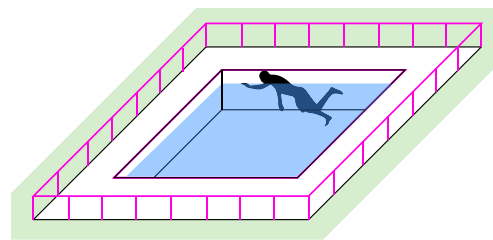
(A): Fencing located around an in-ground swimming pool
